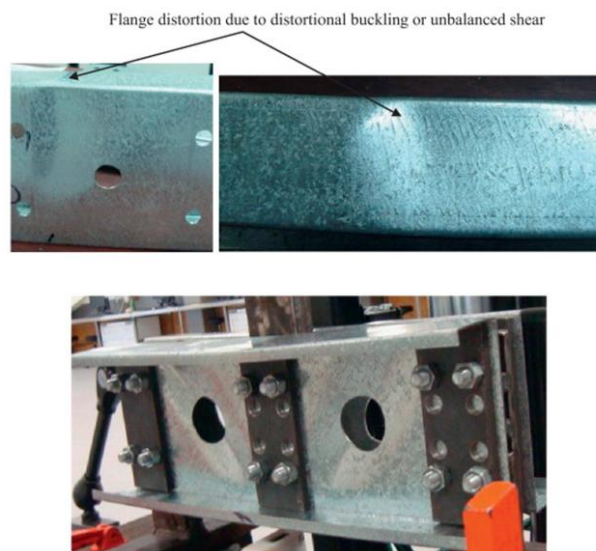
21. Failure modes of LCBs with web openings and no straps as reported by Keerthan and Mahendran [80]
